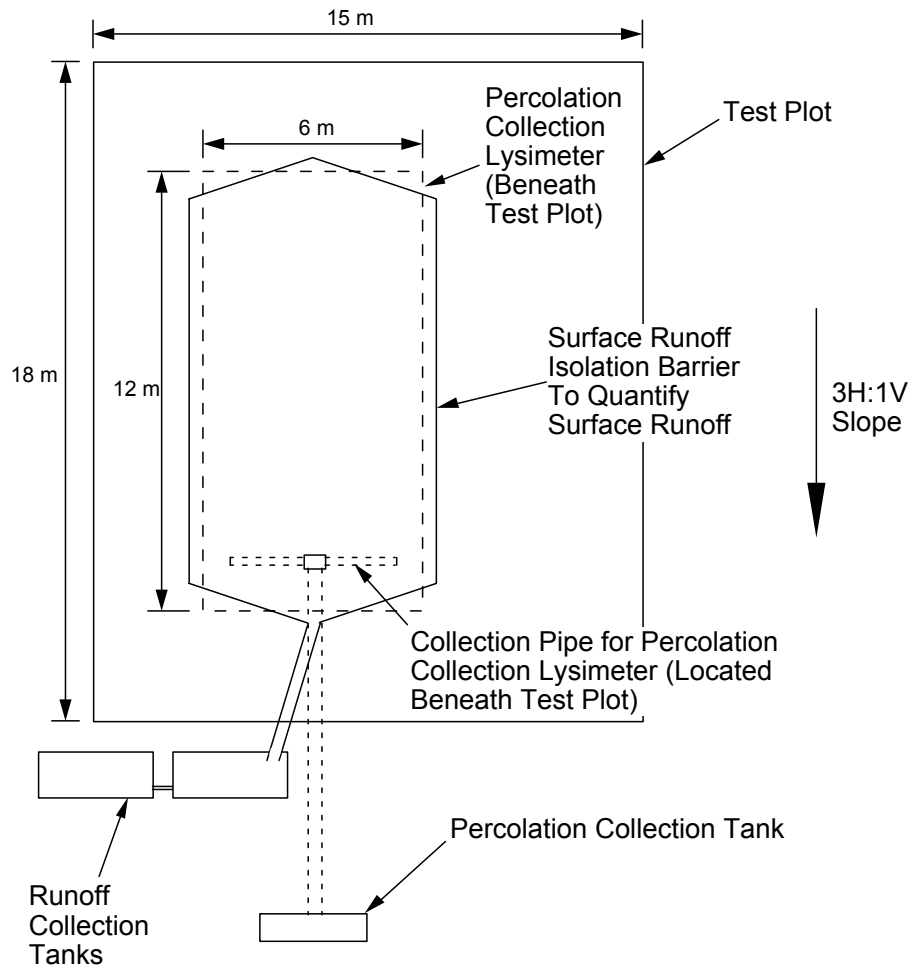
Plan view of test plot arrangement at Omega Hills landfill (after Montgomery and Parsons, 1989).
